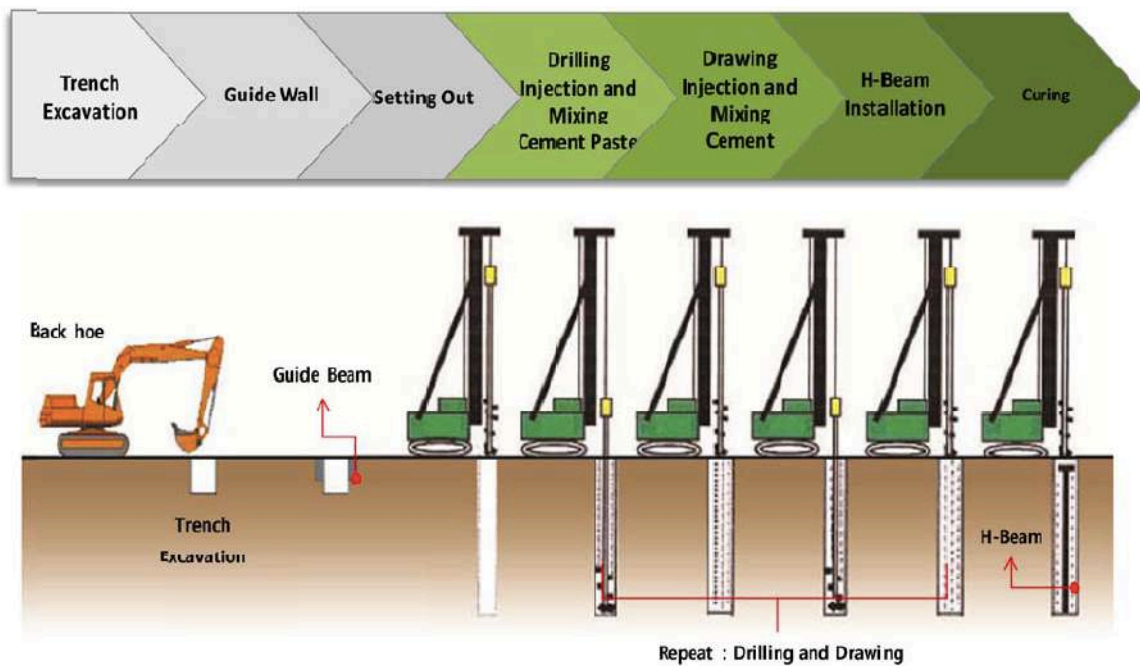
c Construction of H-beam reinforced Soil Cement Wall
